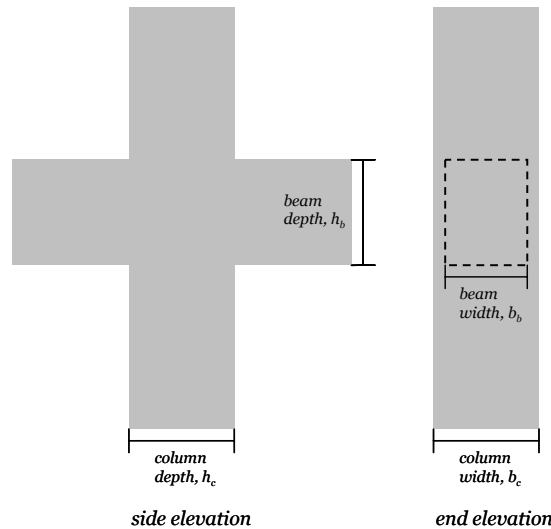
The proper labeling of the width and depth of the beam-column joint (Adapted from Pessiki 1990).
